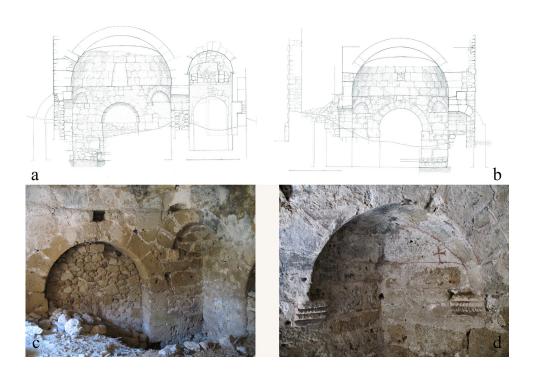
San Lorenzo Vecchio, the trichora (E): a) sections EW; b) section NS; c) masonry and arches of the NW corner; d) detail of a
